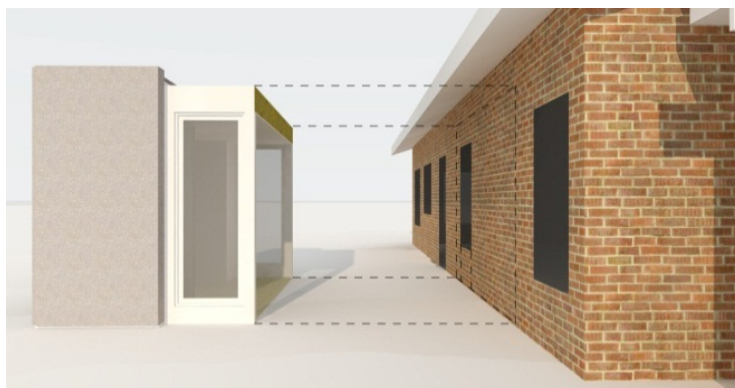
Exploded view of REEM-house attachment at an existing window with the sill removed to create a door to the new full bath.
